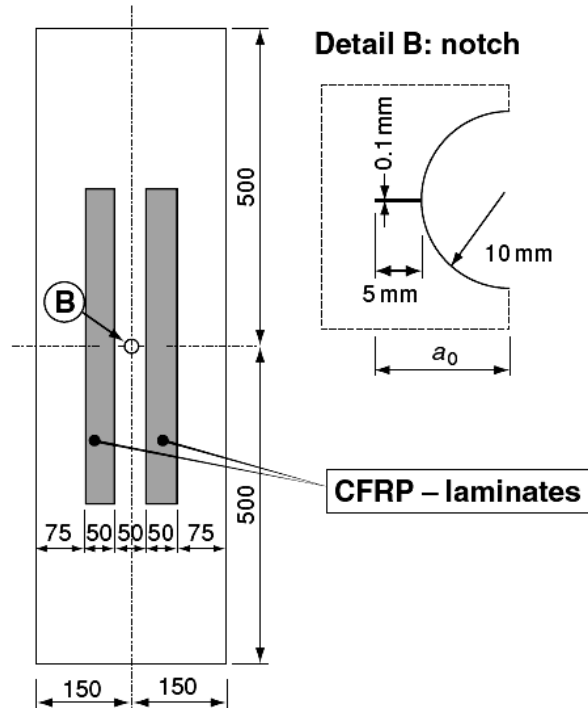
Notch steel plate test specimen, Colombi et al. (2003)
